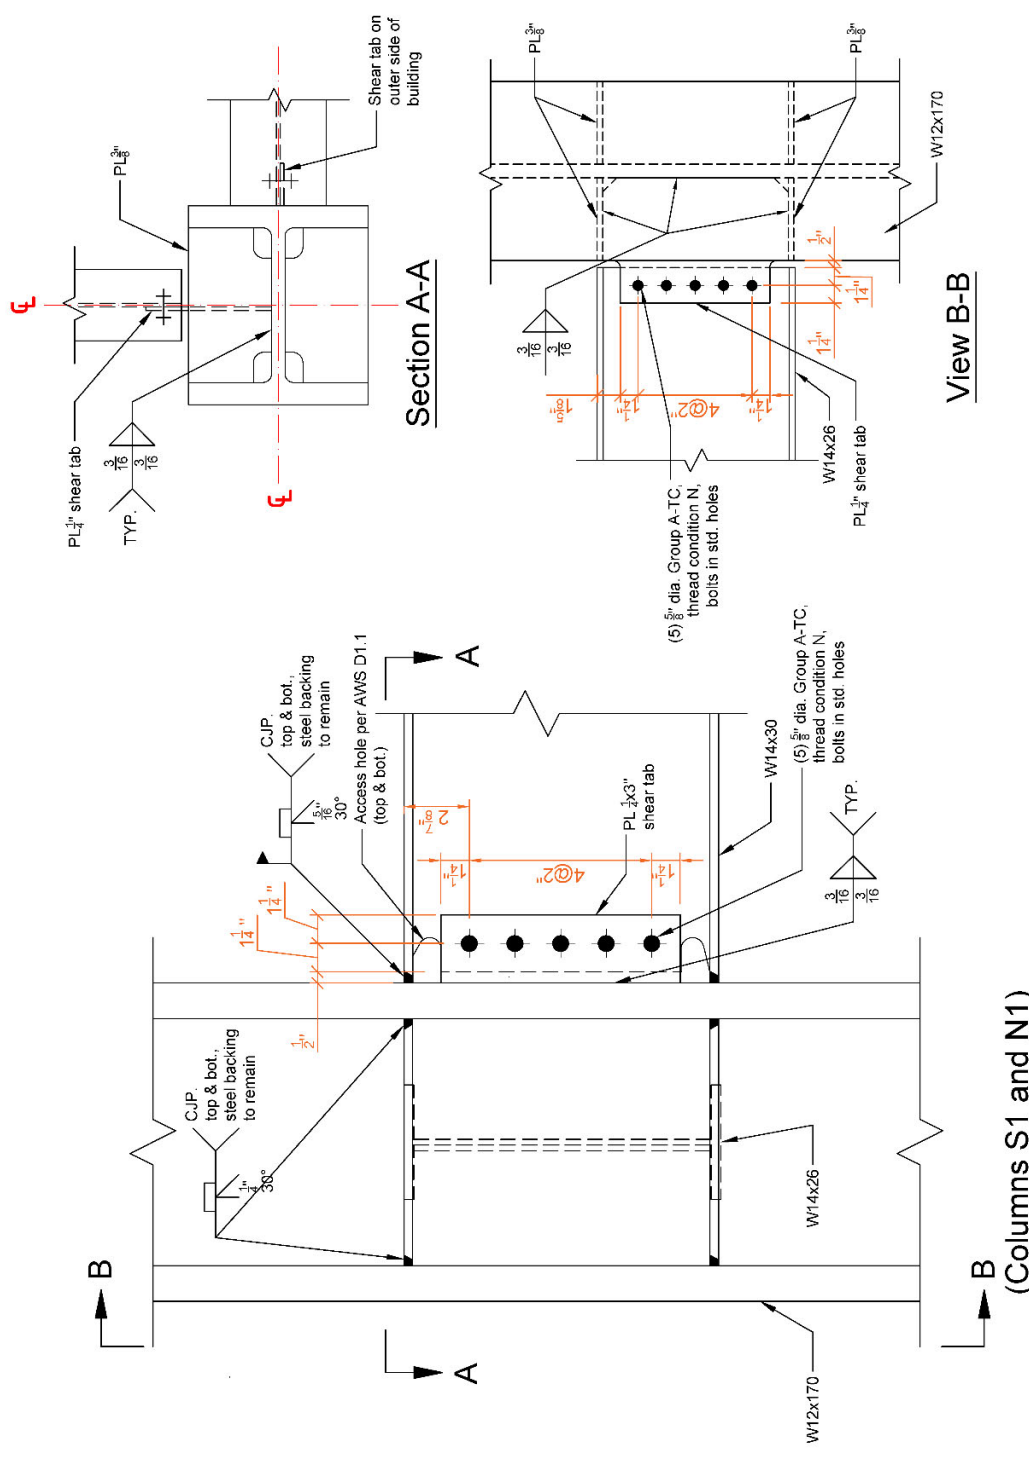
All Flange Weld (AFW) Collector-to-Column Connection (DWG S09)
